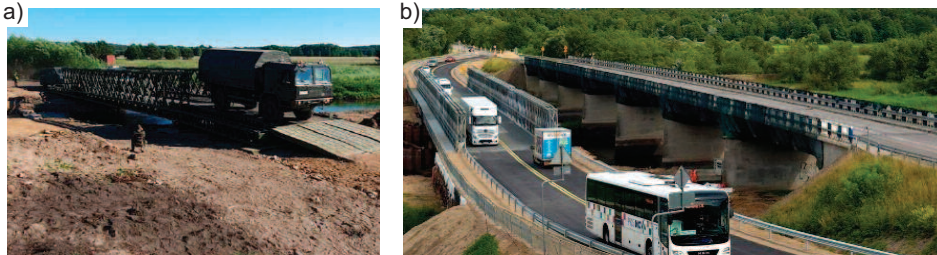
Examples of the use of modular bridges: a) at the military training ground in Orzysz; b) as a detour bridge near Wiza [7]
